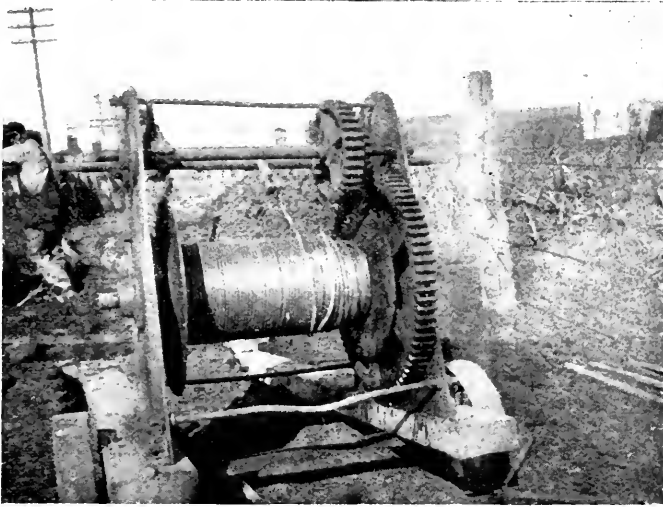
LARGE WINCH FOR PULLING CABLE AND MACHINE (FOUR MEN TO OPERATE).
